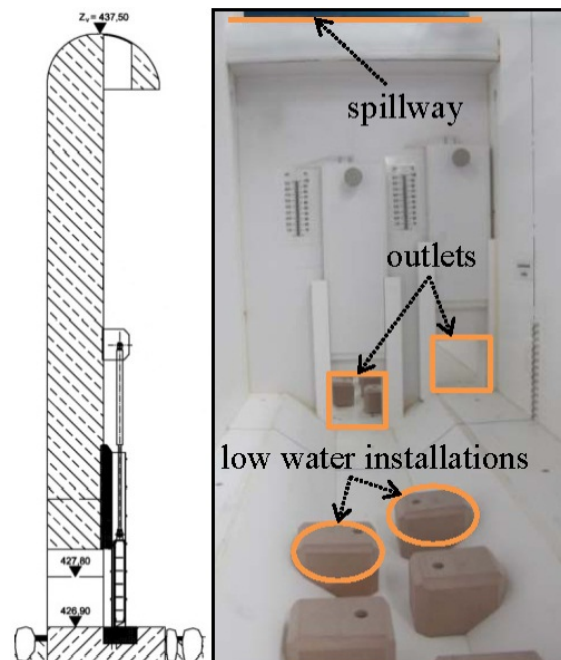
cross section flood retaining structure; physical model, view upstream with spillway, outlets and low water installations
